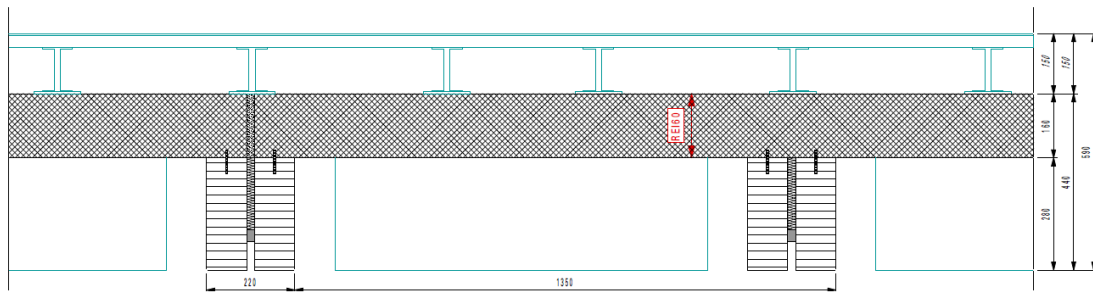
Floor cross-section of the timber concrete composite floor elements (Jung 2018).
